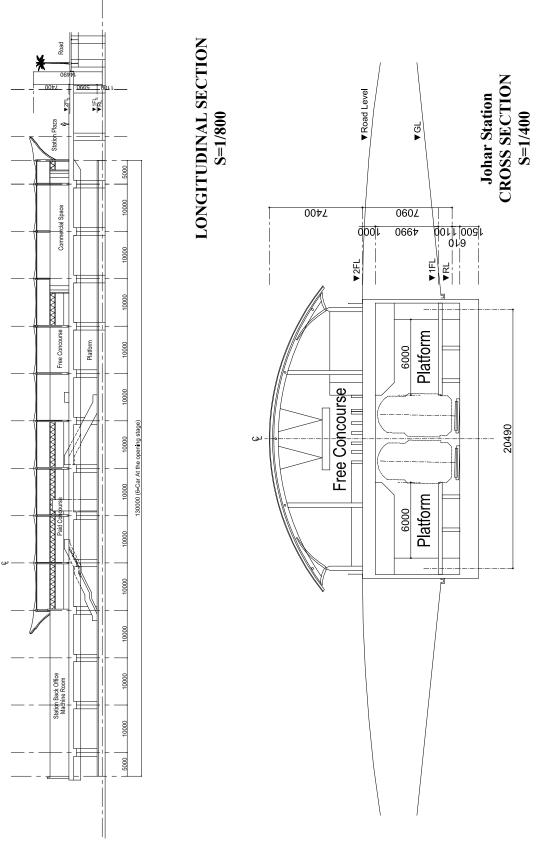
Station Architect Conceptual Plan (Johar Station)
